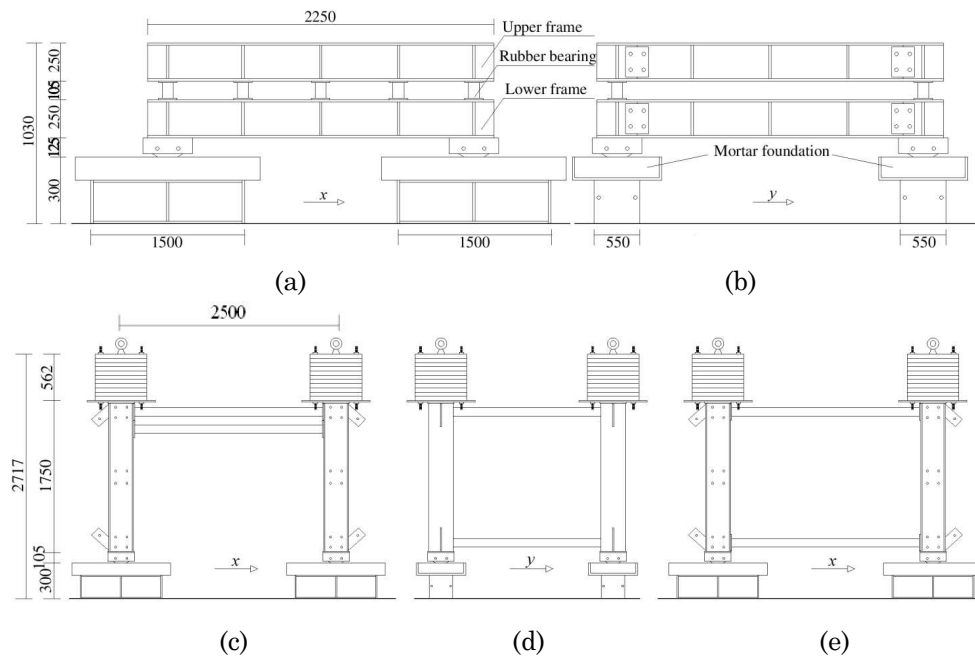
Details of the test specimen (units in mm): (a) front view of short specimen; (b) lateral view of short specimen; (c) front view of TTB specimen; (d) lateral view of TTB and TBB specimens; (e) front view of TBB specimen
